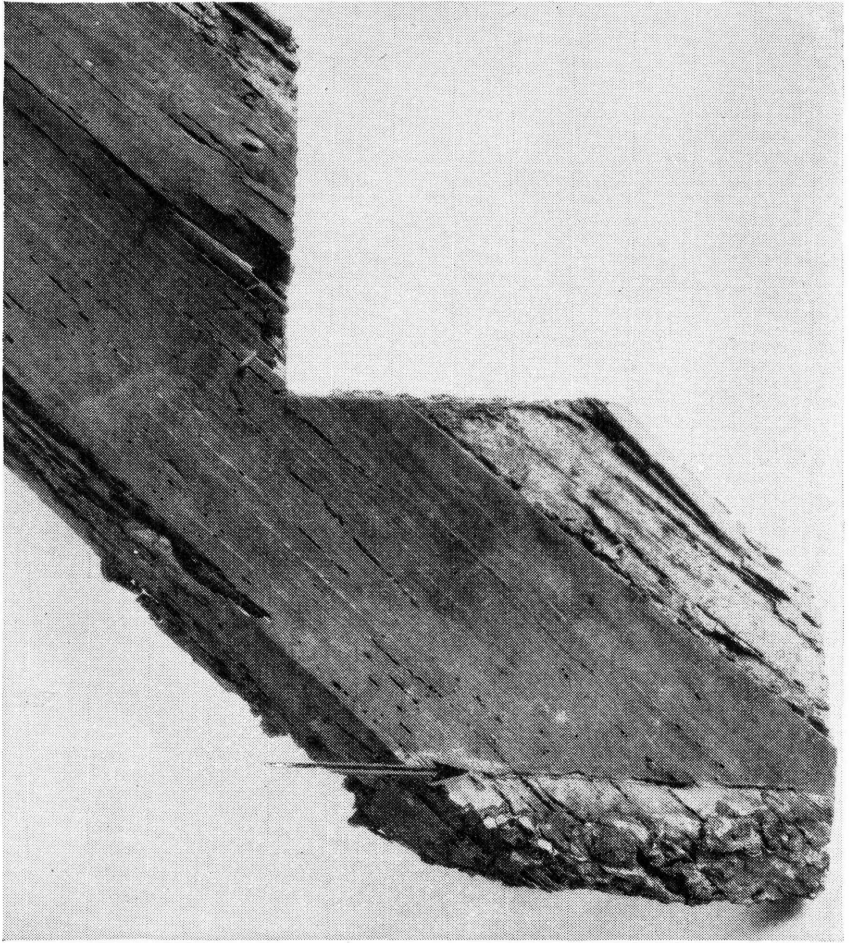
Termite damage to stair carriage in basement, resulting from the member being put in place before the concrete floor was poured. Line across bottom of carriage (arrow) indicates floor level.
